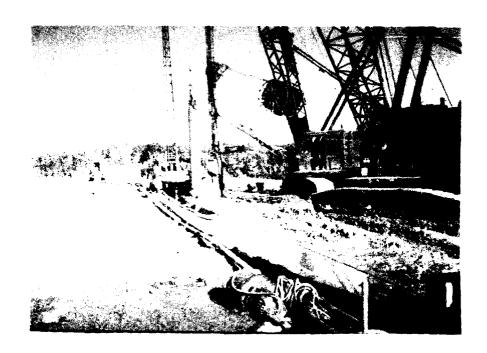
Excavating with chisel on Panel T-2 (November 22, 1983)
